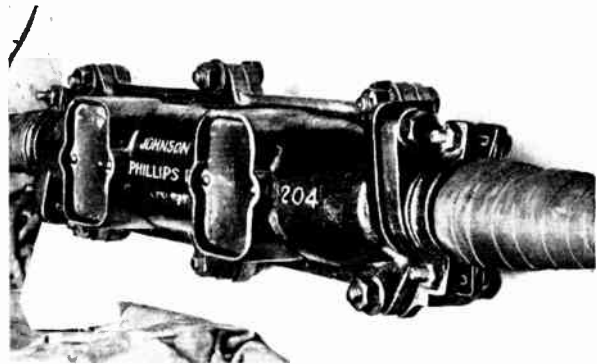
L.T. STRAIGHT-THROUGH CABLE JOINT. Complete with C.I. box filled and armour grips bolted on.
